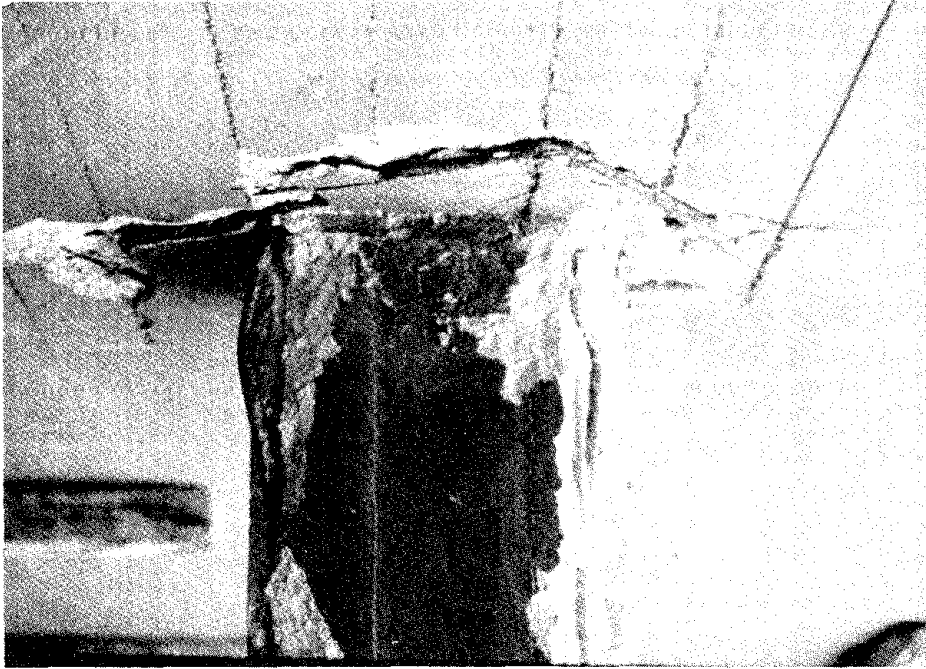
Typical damage of column-to-slab connections. A steel plate has been fixed at the top of the column to add support.
